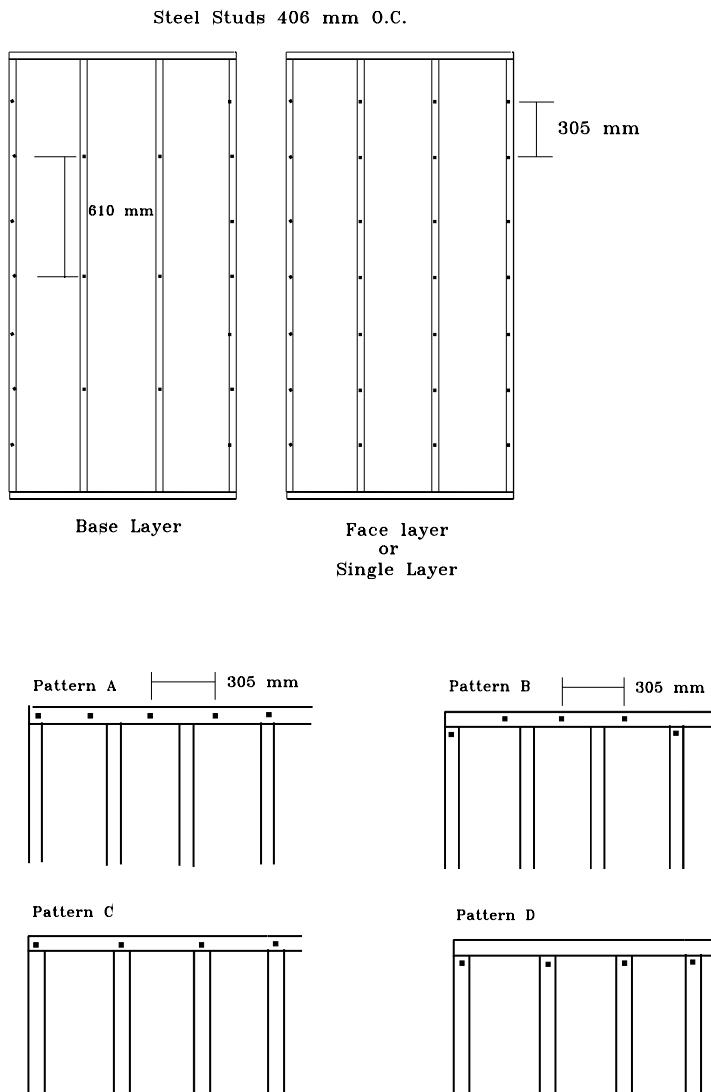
Screw attachment layout for single and double-ply gypsum board attached parallel to steel studs at 400 mm o.c., single tracks at top and bottom
